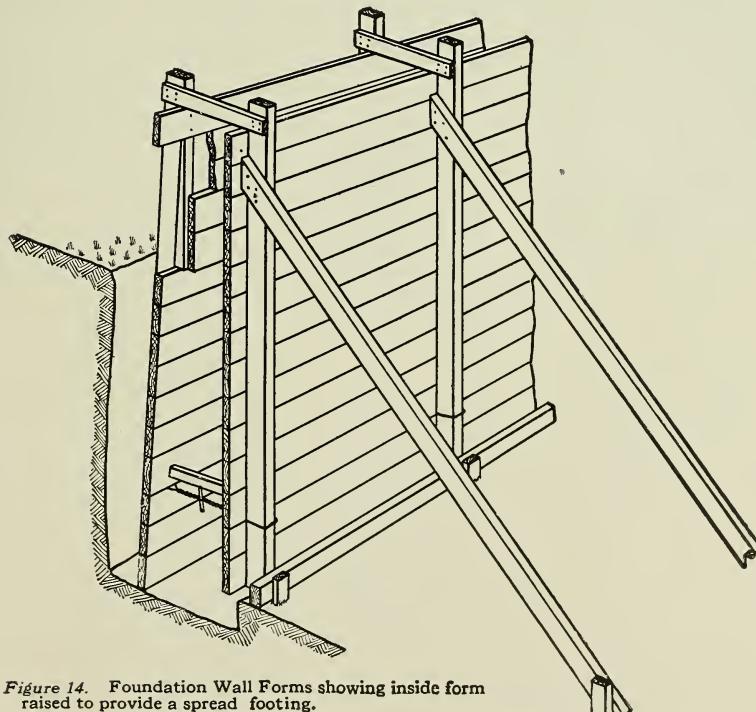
Foundation Wall Forms showing inside form raised to provide a spread footing.
